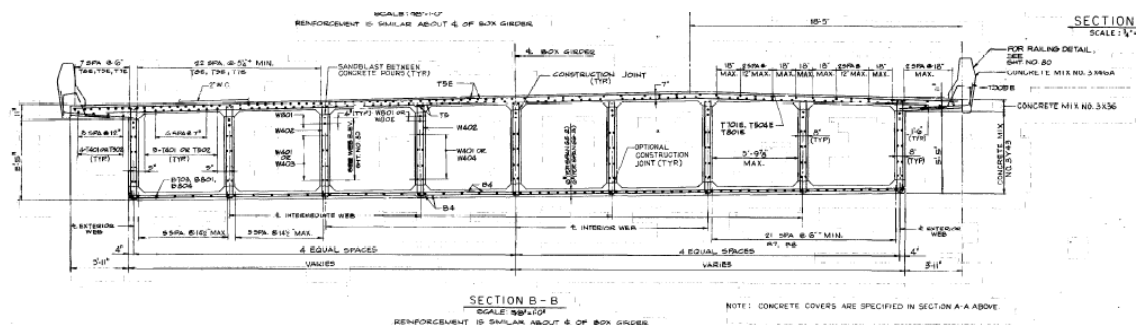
Bridge 69818 N cross reinforcement section view B
